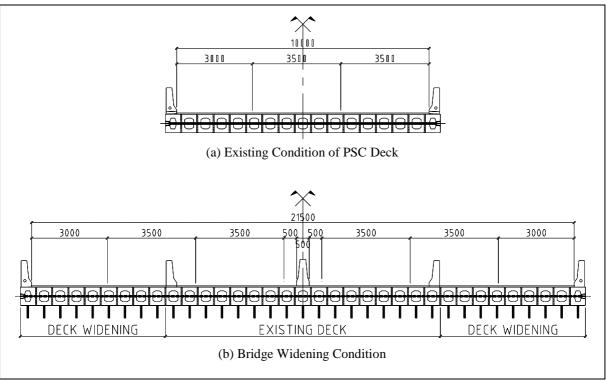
Typical Cross-Section of Widened Bridge for Full 4-Lane
